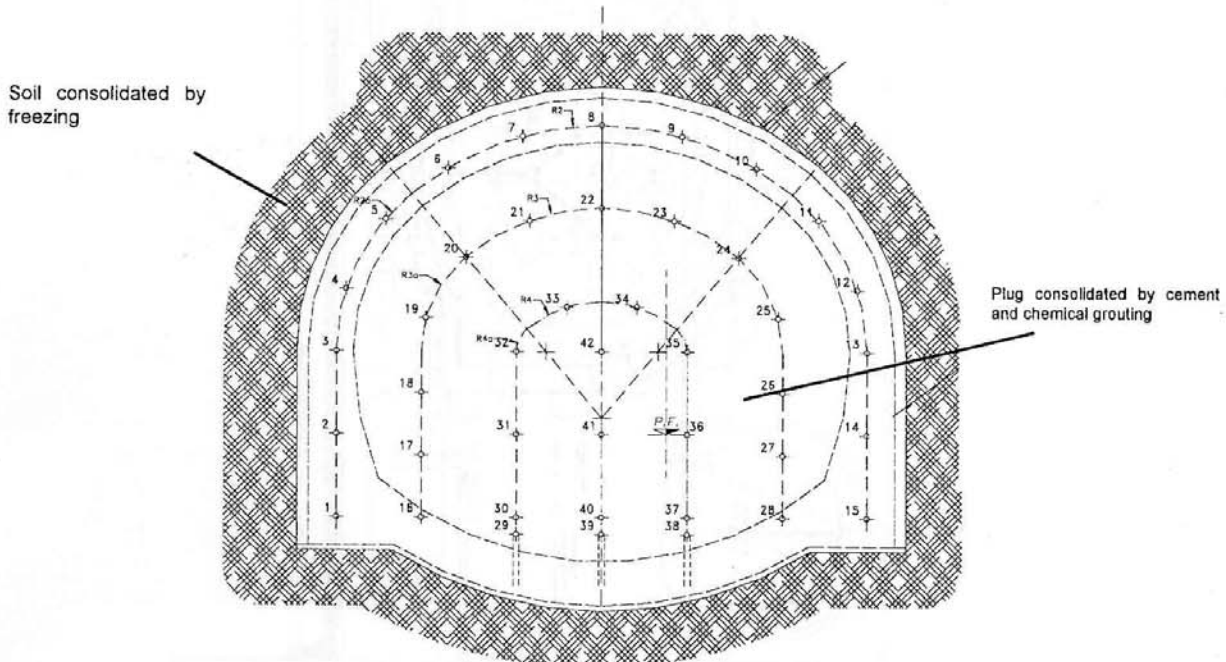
University Station; consolidation and plugging of the platform tunnels
